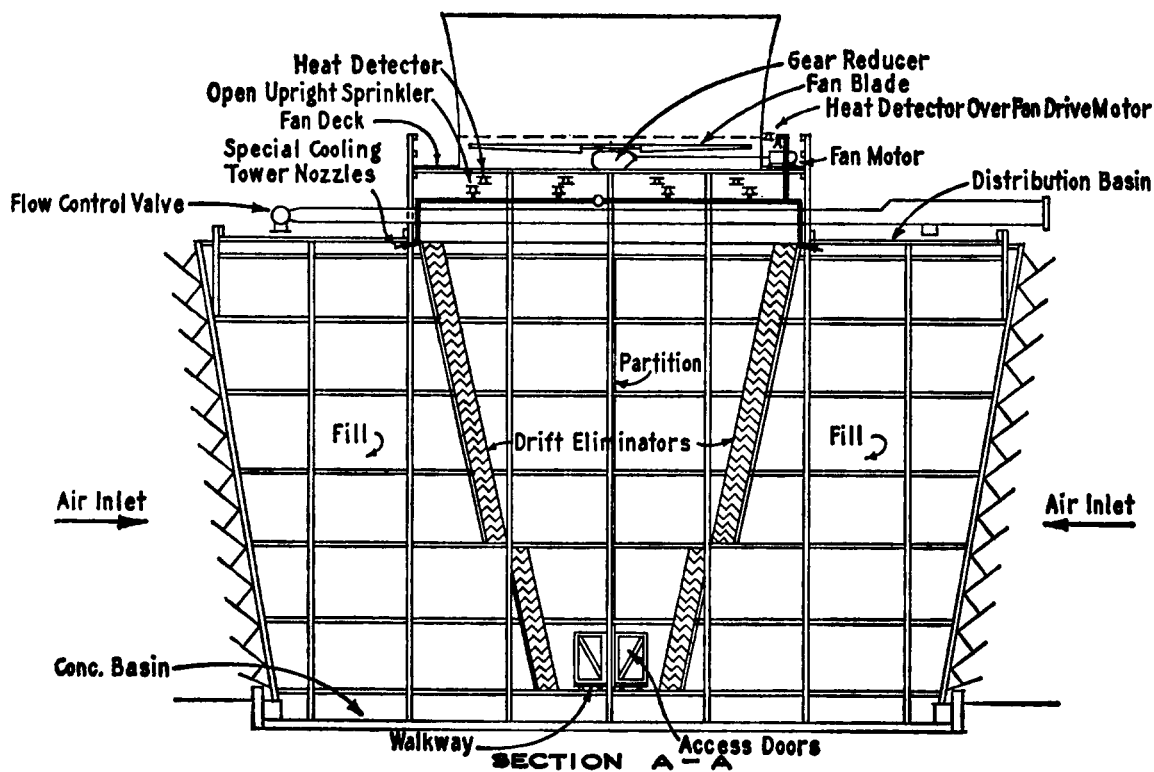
Typical deluge fire protection arrangement for crossflow towers.
